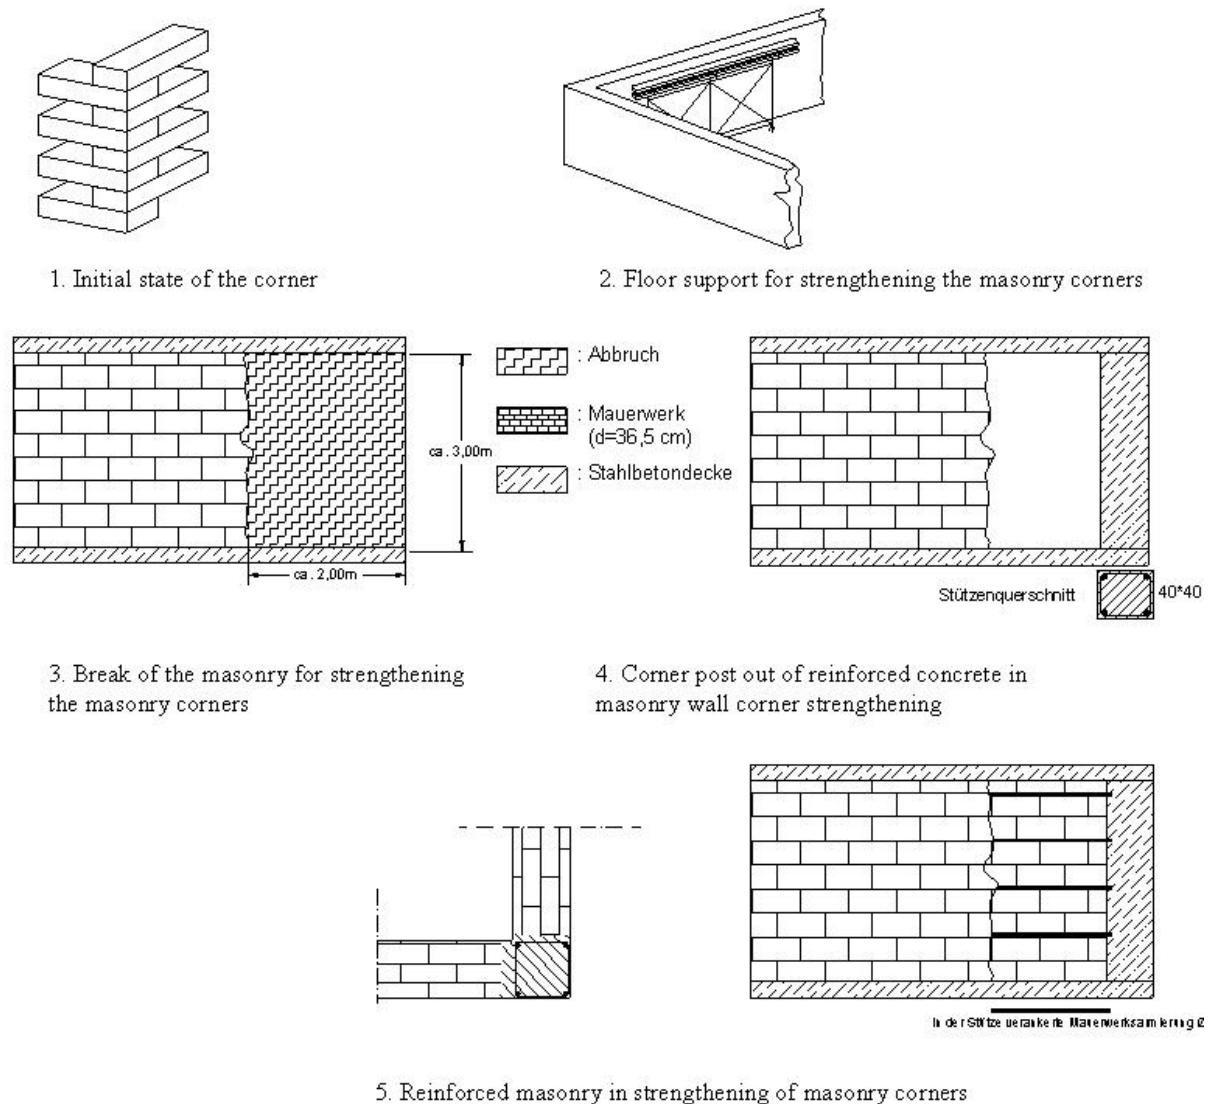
Strengthening of masonry corners (after Bourlotos, 2001)
